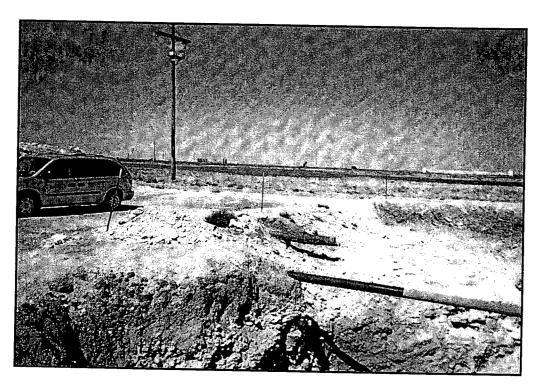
View of site looking south from northern edge of excavation (Note rolled fencing, staged for removal).
